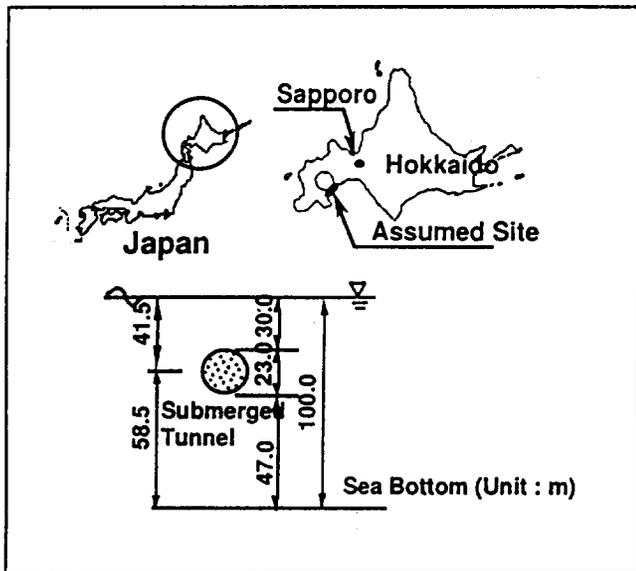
Location of proposed SFT crossing for Uchiura Bay, Japan.
